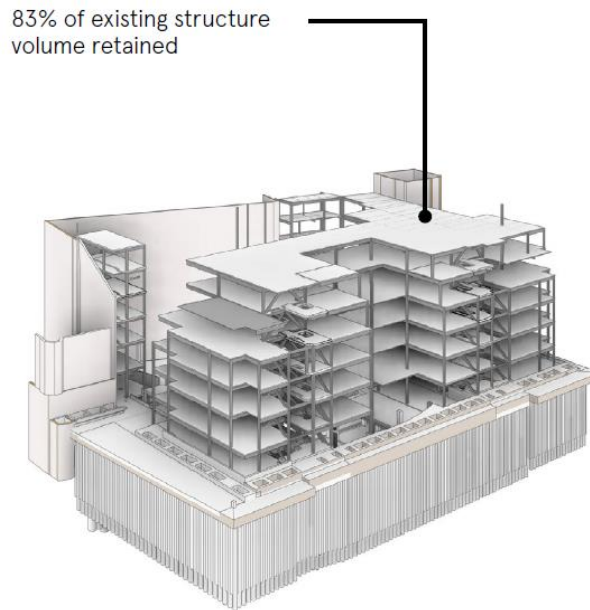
83% of the existing structure volume would be retained, including the steel frame and foundations.
